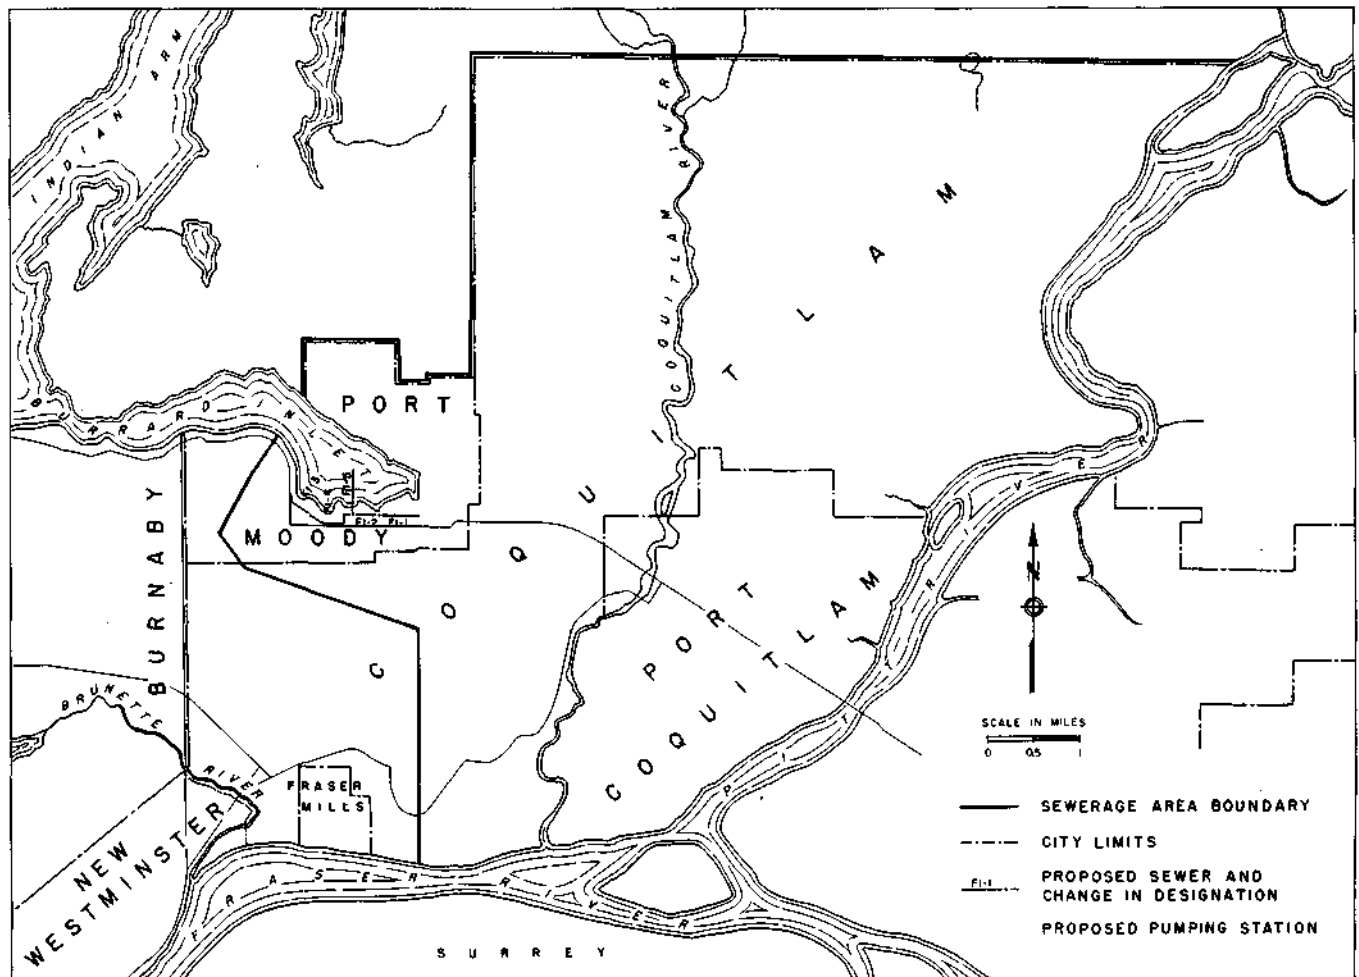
Proposed Layout of Plan F1 - Coquitlam Sewerage Area
